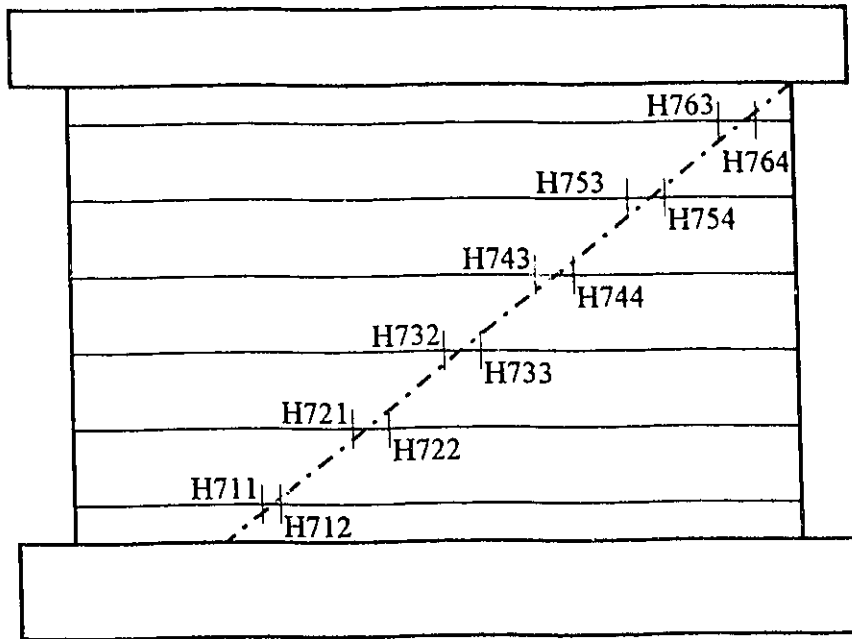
Strain Gauges on Horizontal Reinforcement for Wall 7 (Diagonal One)
